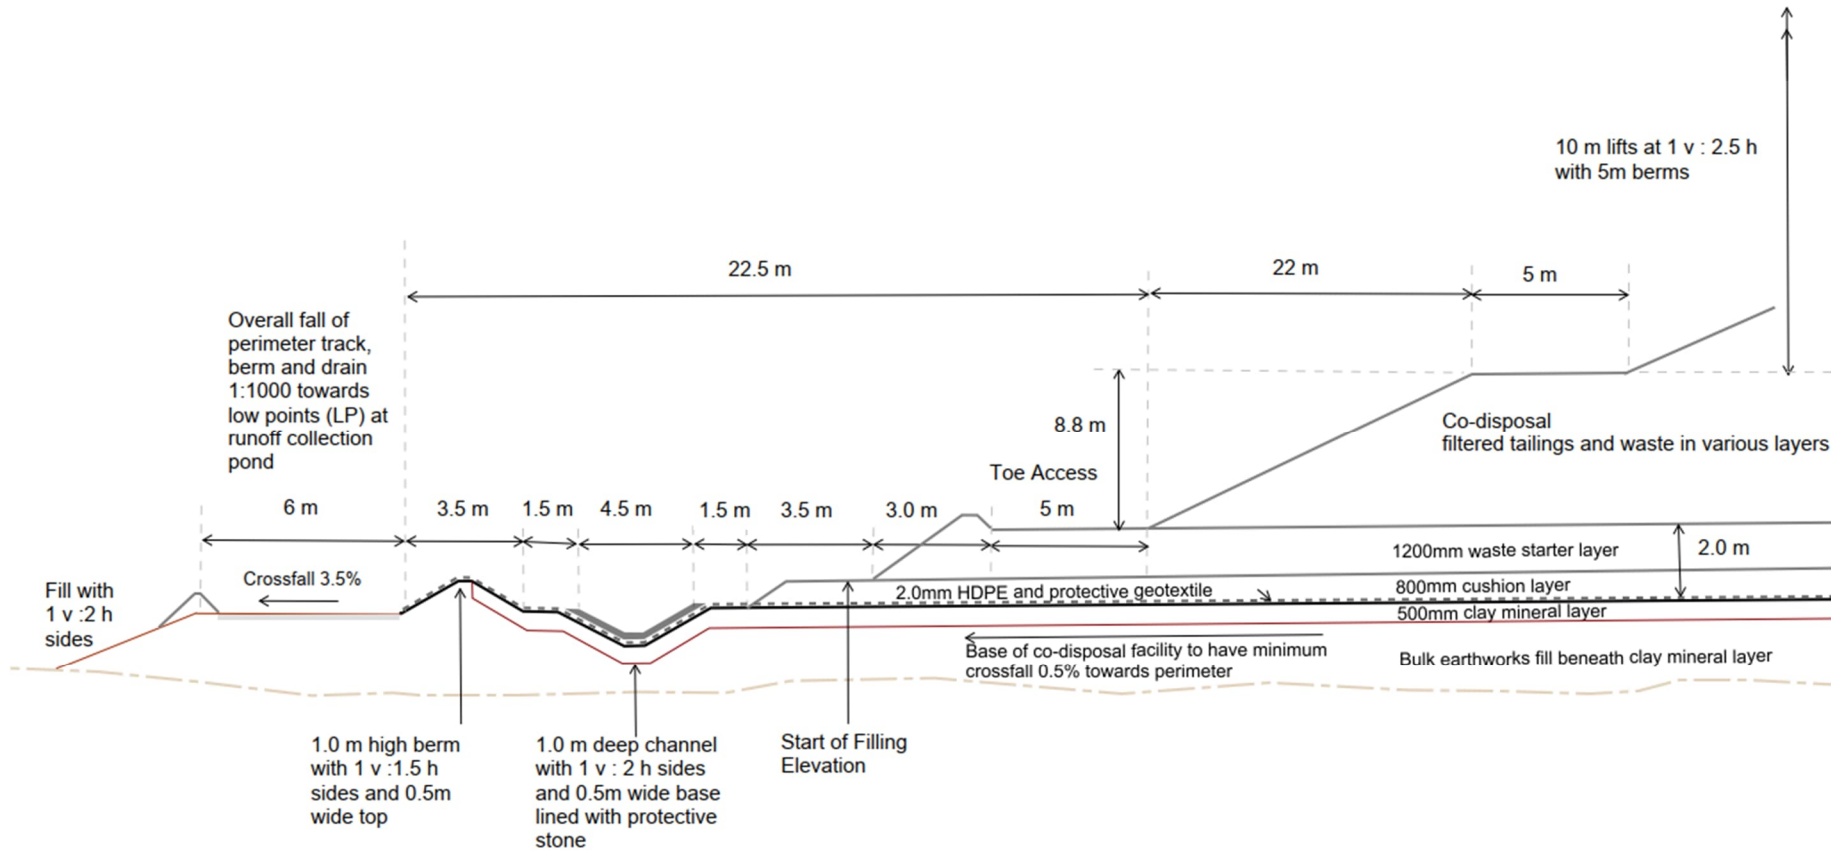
Cross Section of Co-Disposal Facility Perimeter
